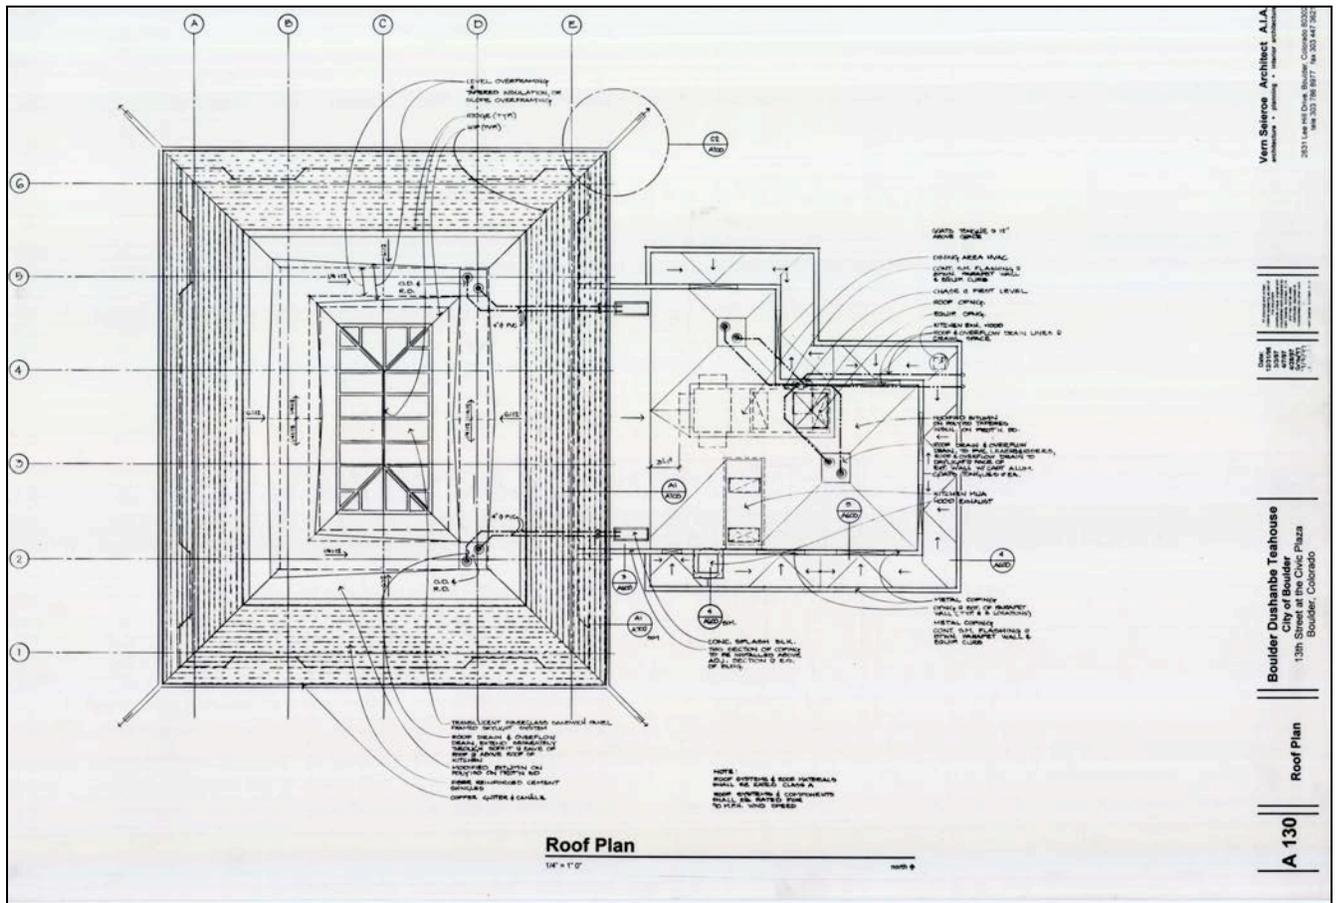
Construction Drawing A130, Roof Plan, Vern Seieroe, AIA, Architect (north is up on drawing)
